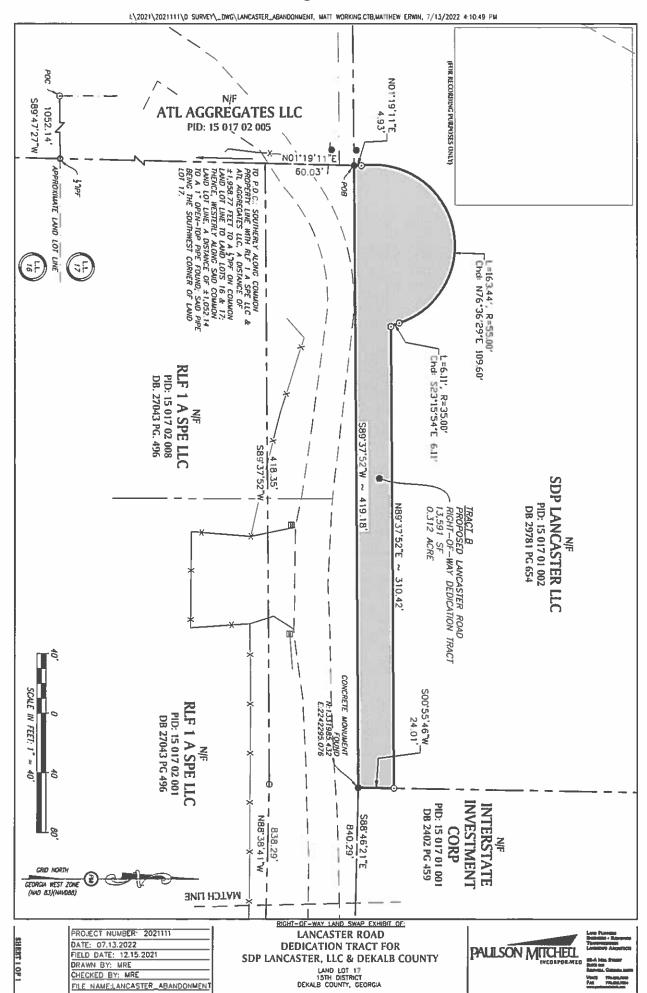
of 2) Lancaster Road Right-of-Way Dedication Tract (TRACT B)
